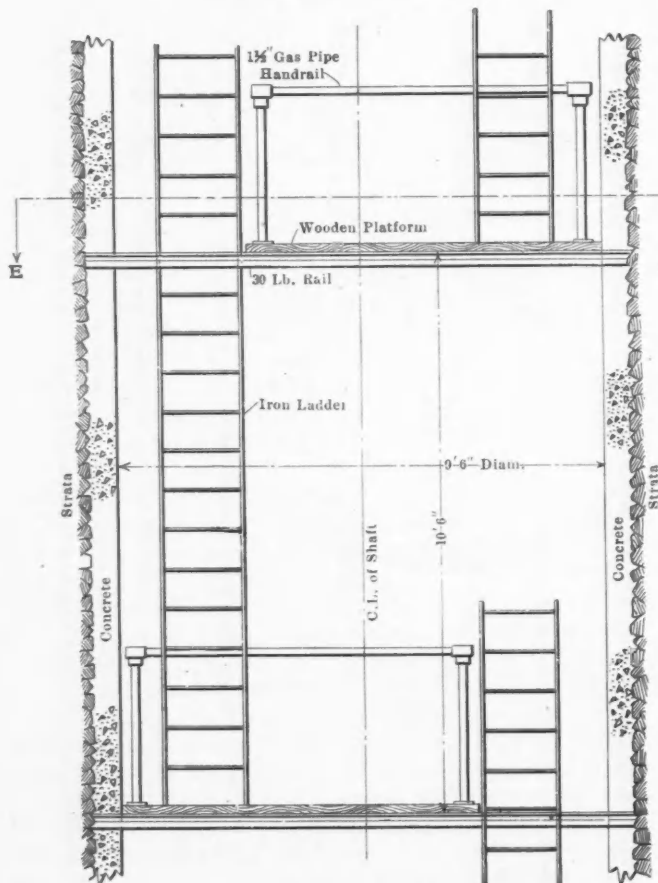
SECTION GG SHOWING PLATFORMS AND LADDERWAY
